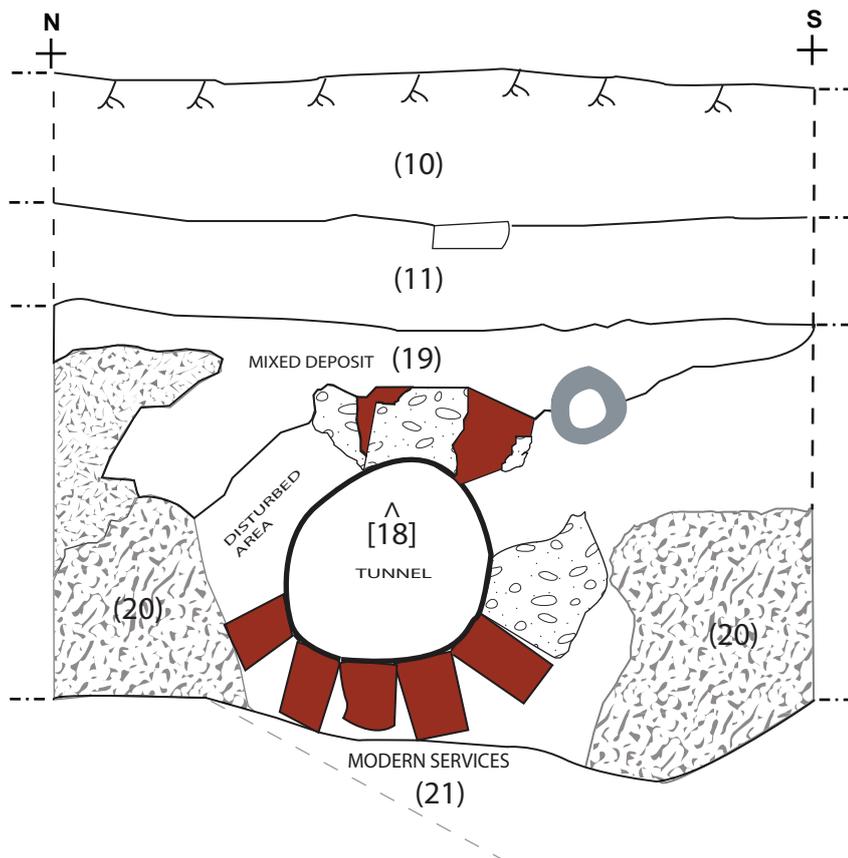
Elevation section drawing of 19th Century lead pipe and brick service tunnel [18]
